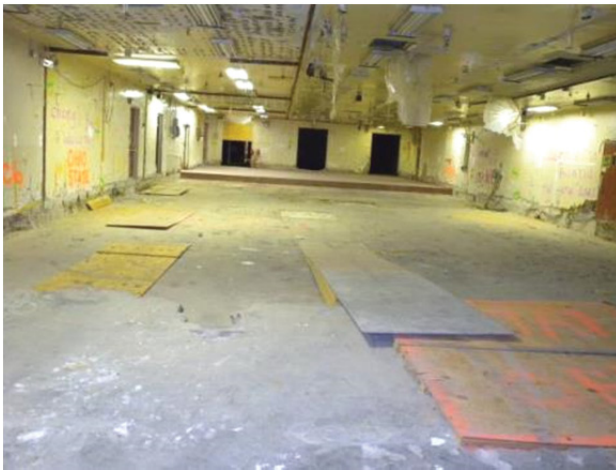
T Bldg. Rooms 39-44, 48-50 View G
